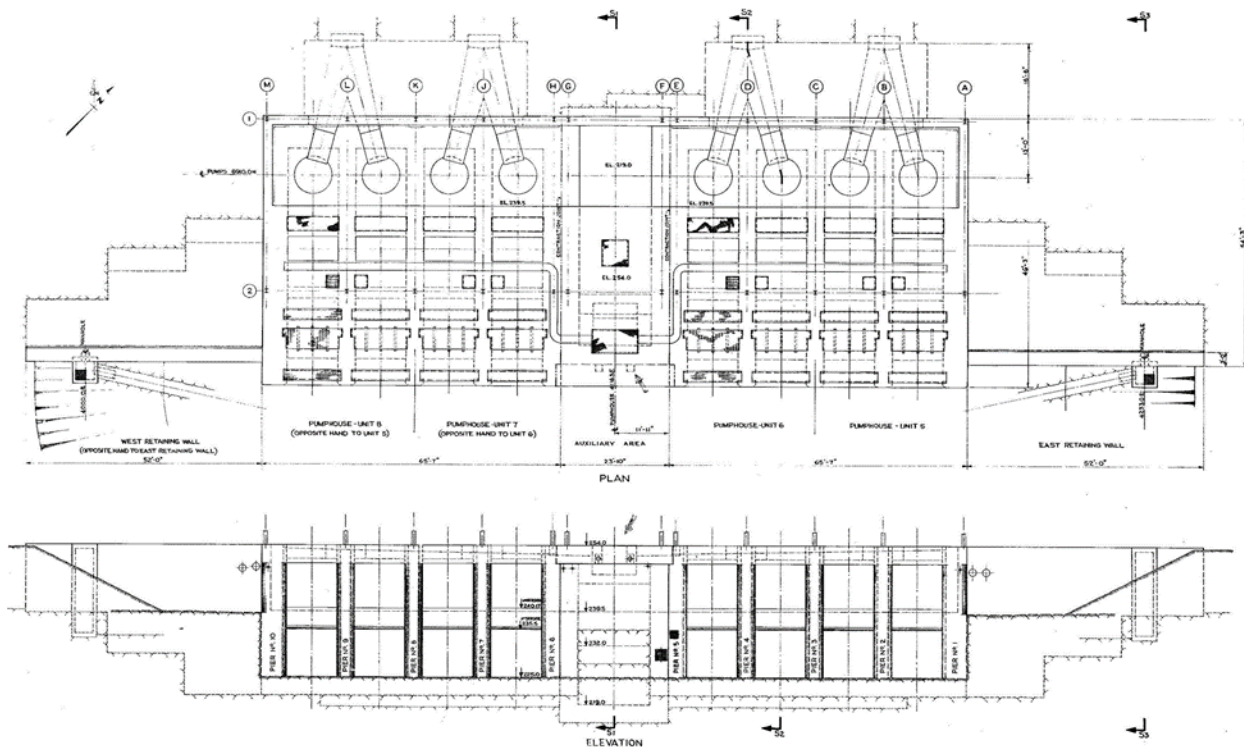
Plan and elevation views of Pumphouse 3 (Units 7 and 8) from historical drawing (NA21-D H-00000-1764_DRG_000_v00)
